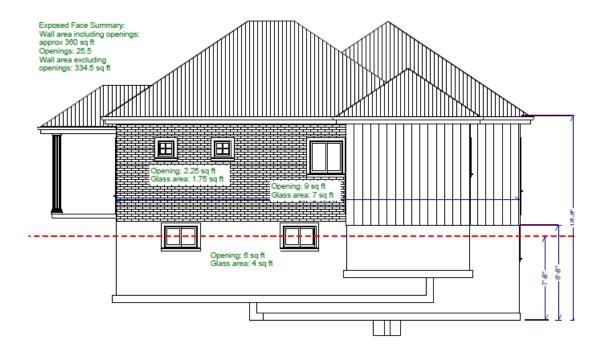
Proposed left (northwest) elevation. (Rick Wilson, 2051864 Ontario Inc.)
